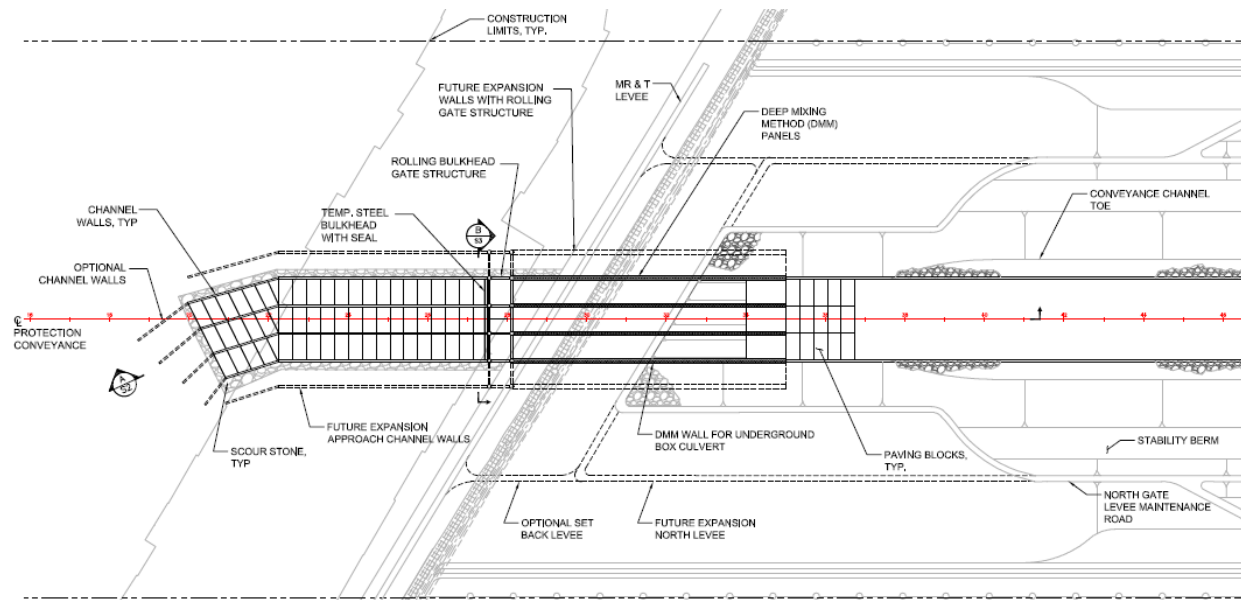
Alt. C – Alternate Plan View & Construction Plan for the Inlet/Approach Channel, Control Structure, Submerged Box Culverts & Transition to the Conveyance Channel, with an Option for Future Expansion
